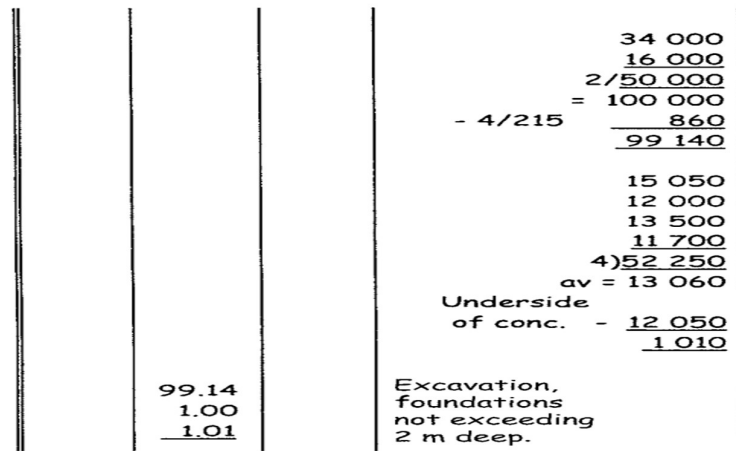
'Waste Calculation' for the Build-up of the Figures Entered in the Dimension Column (Lee, Trench and Willis, 2014).
